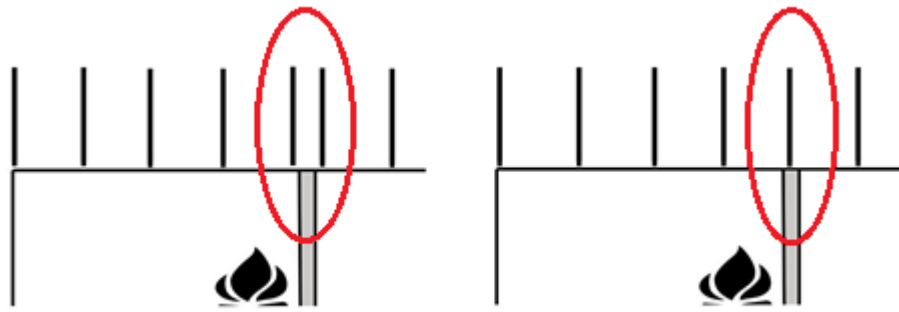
Simplified section of a proper truss arrangement to the left and a poor arrangement to the right (Järphag 2011).
